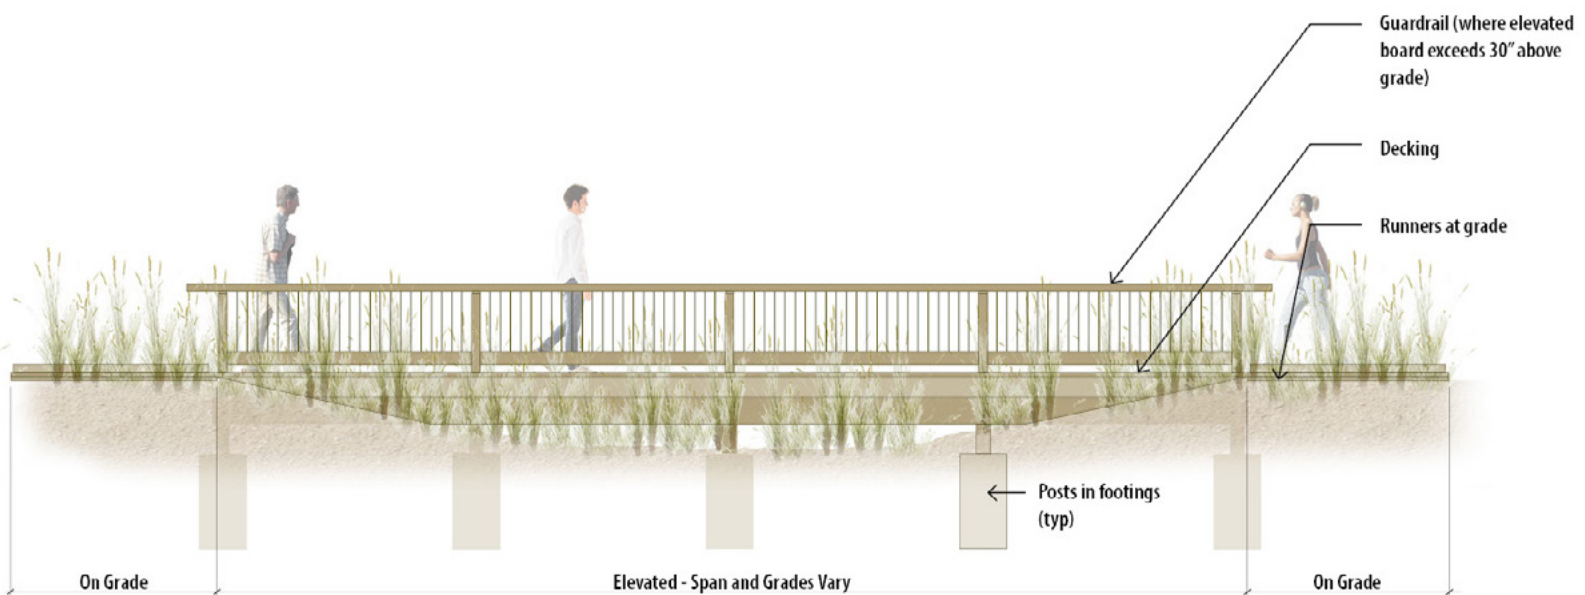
Typical section of a Universal Access Pathway over steep grades (greater than 10% slope)
